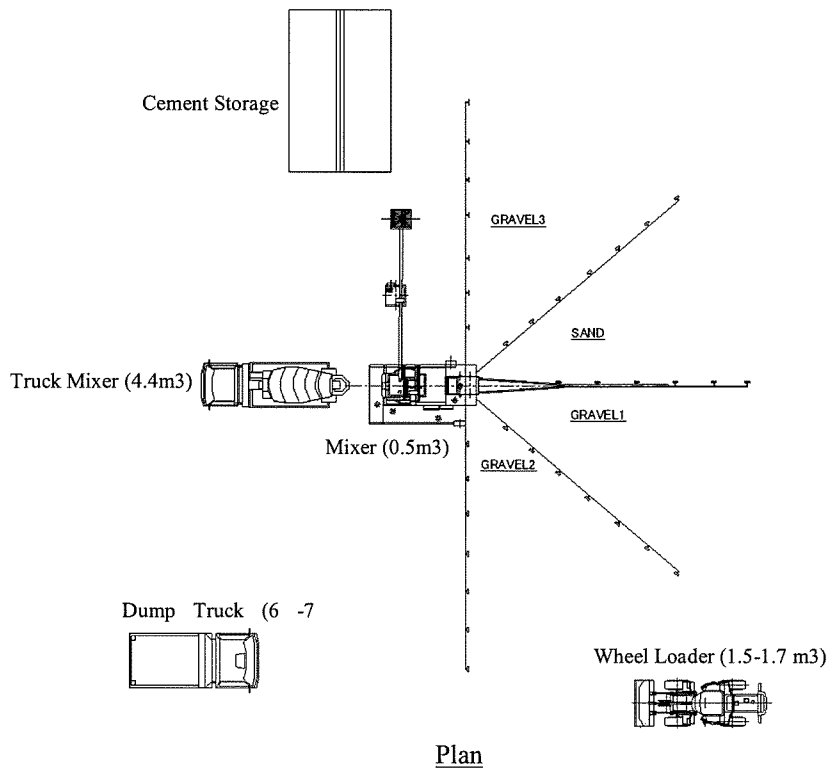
A Portable Concrete Mixing Plant Layout
